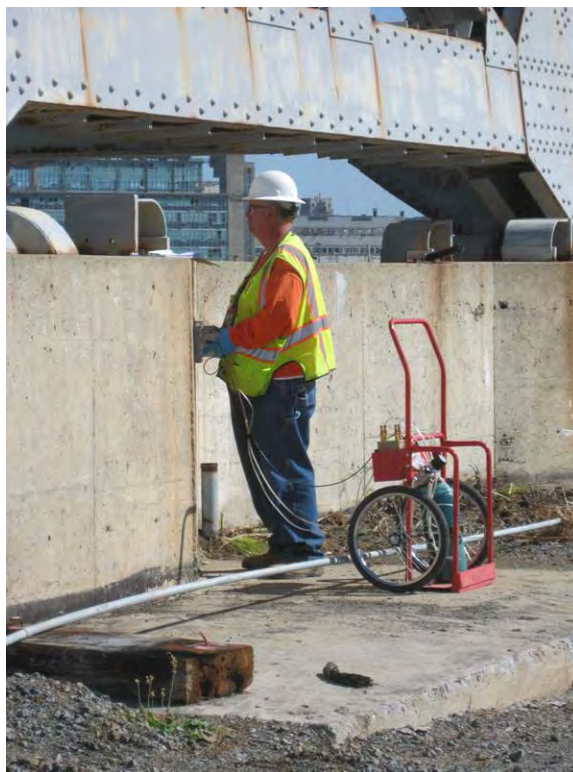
Gamma walkover survey in footprint of former Building 377—June 21, 2012
